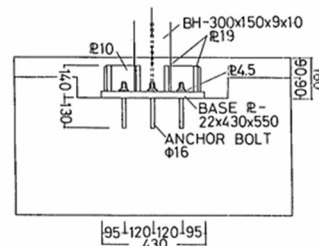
(b) Detail of anchorage of D-Type specimen (unit mm)
